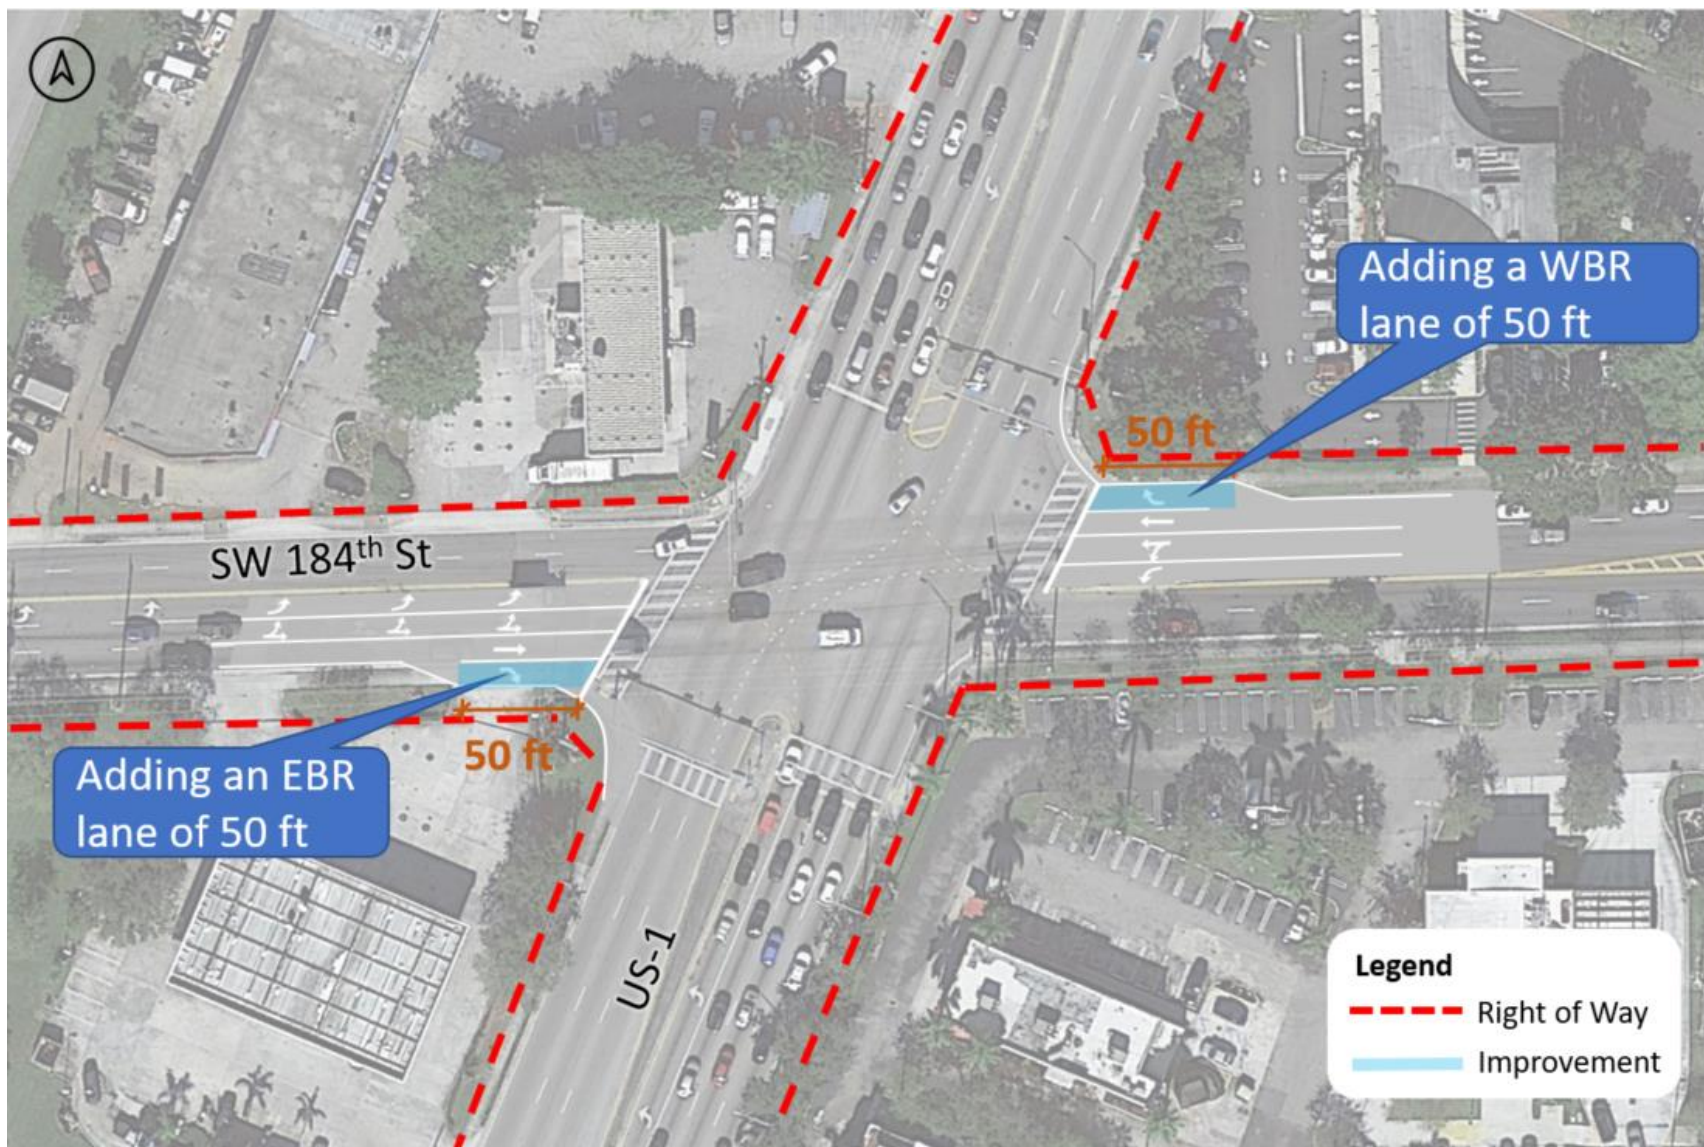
Conceptual Design Plan – US-1 and SW 184th Street
